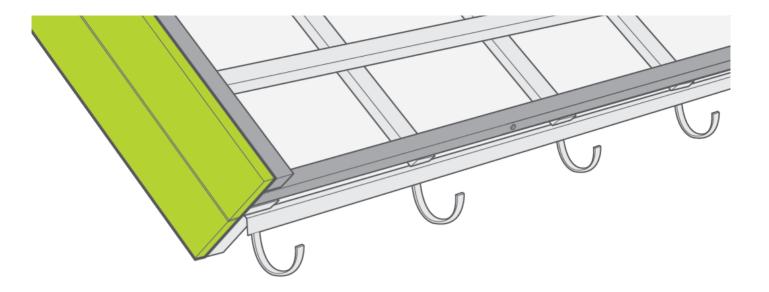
INSTALLING BATTENS FOR EAVES APRON AND FASCIA BOARD
